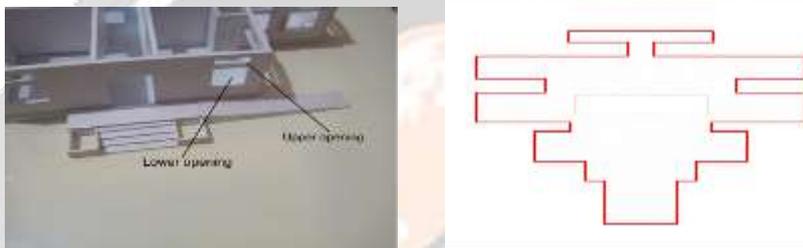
Stack ventilation strategies a) opening at sill level b) open to sky structure
